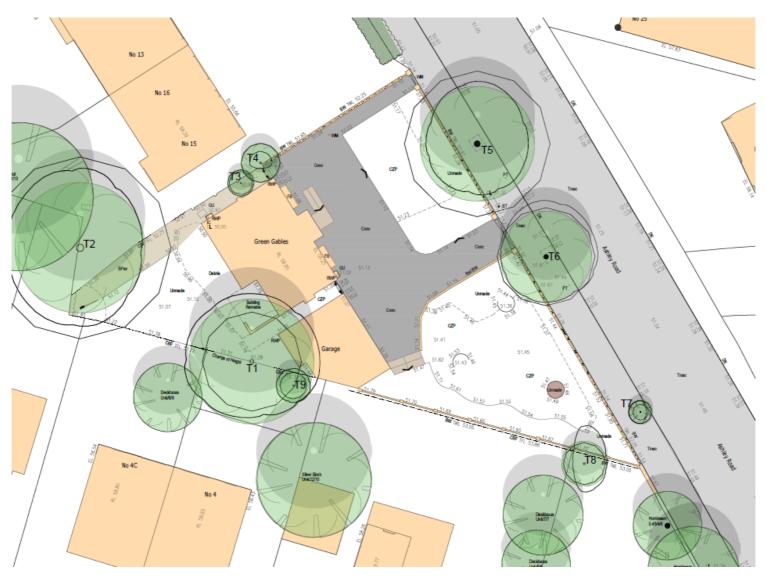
Existing Site Plan (Drawing Number J003968-DD-03)
